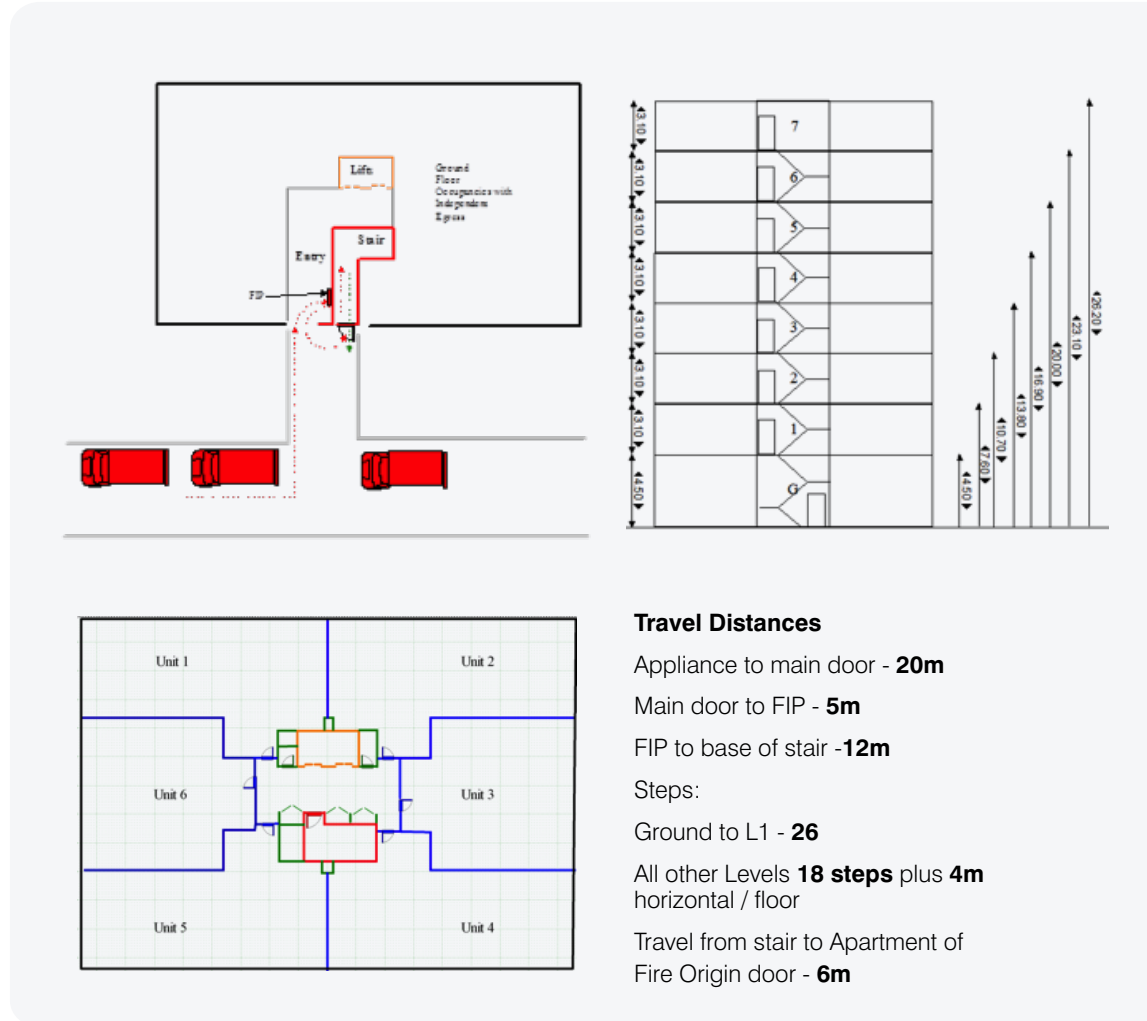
Building layout and critical dimensions for fire brigade intervention modelling.
